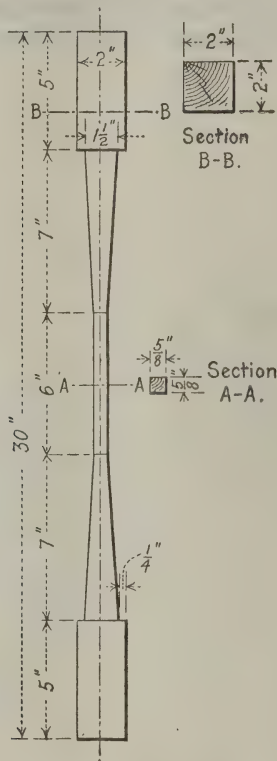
Details of Tension-Parallel-to-Grain Test Specimen.
